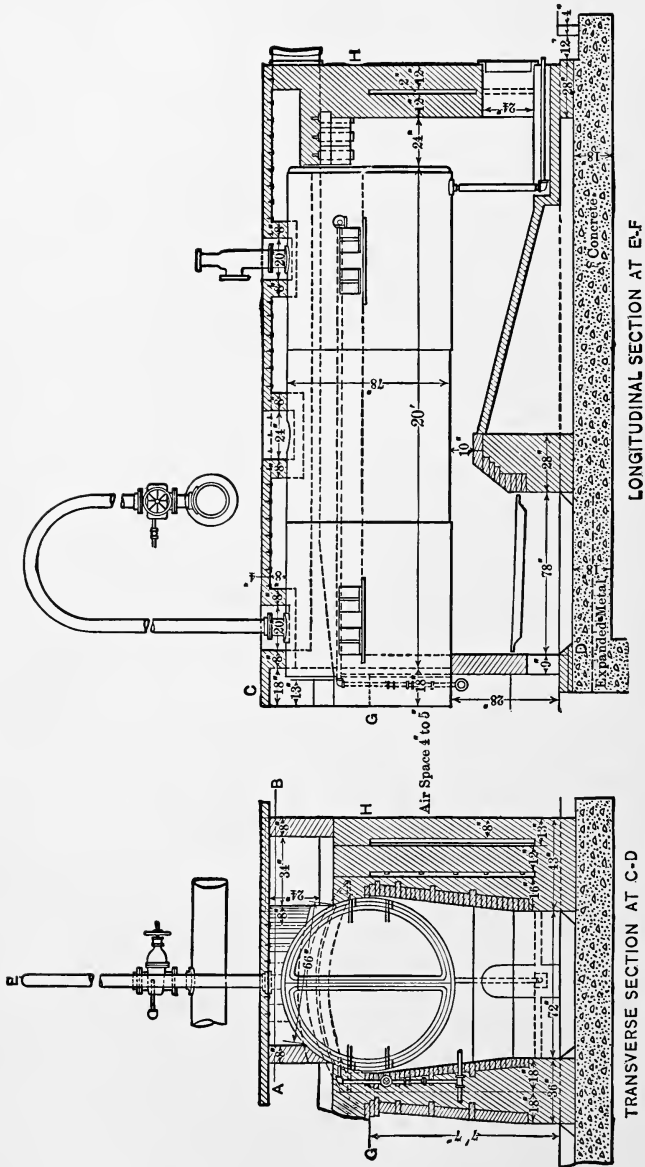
Boiler Setting; "Wood" Mill of the American Woolen Company, Lawrence, Mass.
